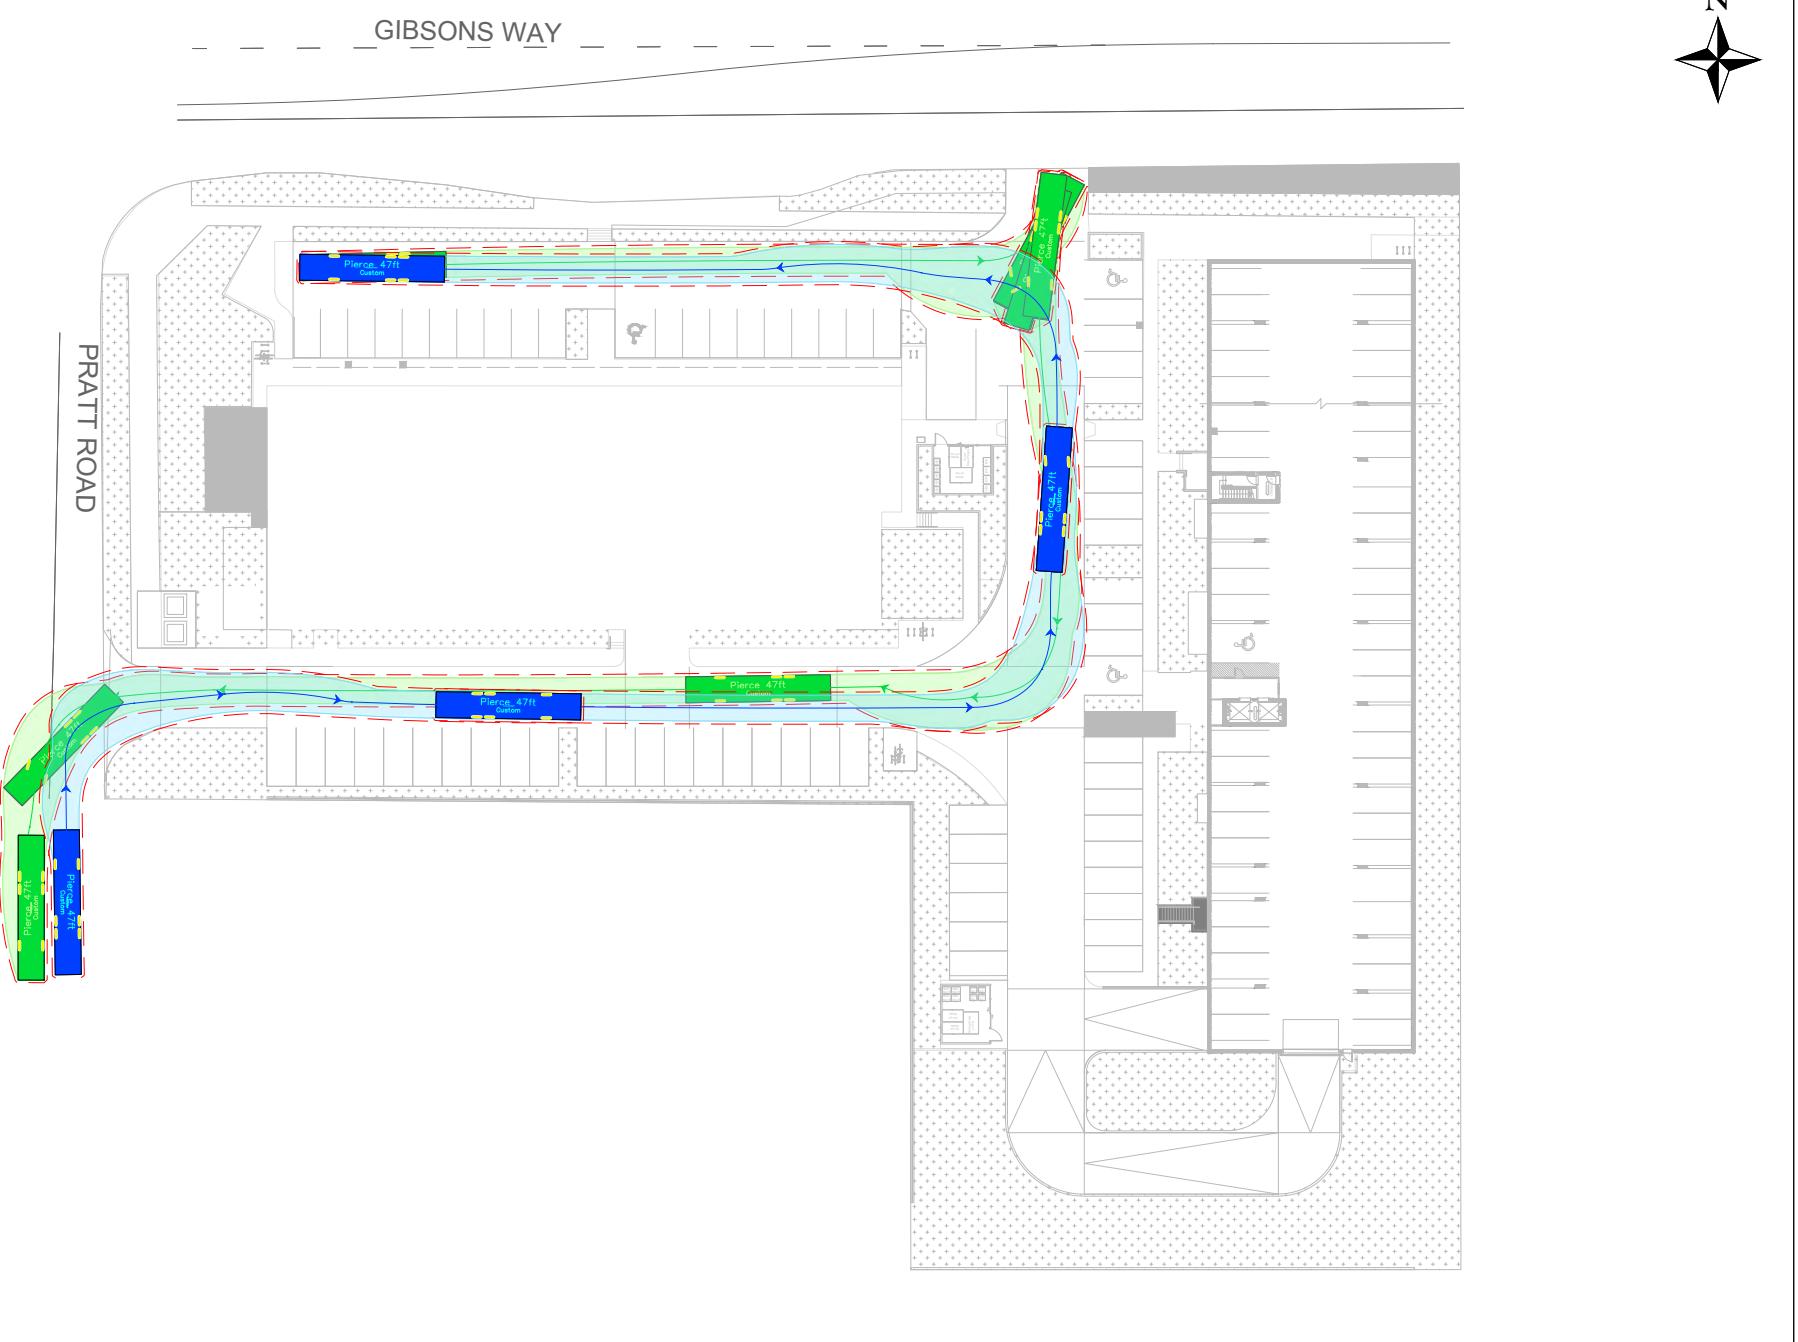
Fire Truck Site Access to/from Pratt Road
